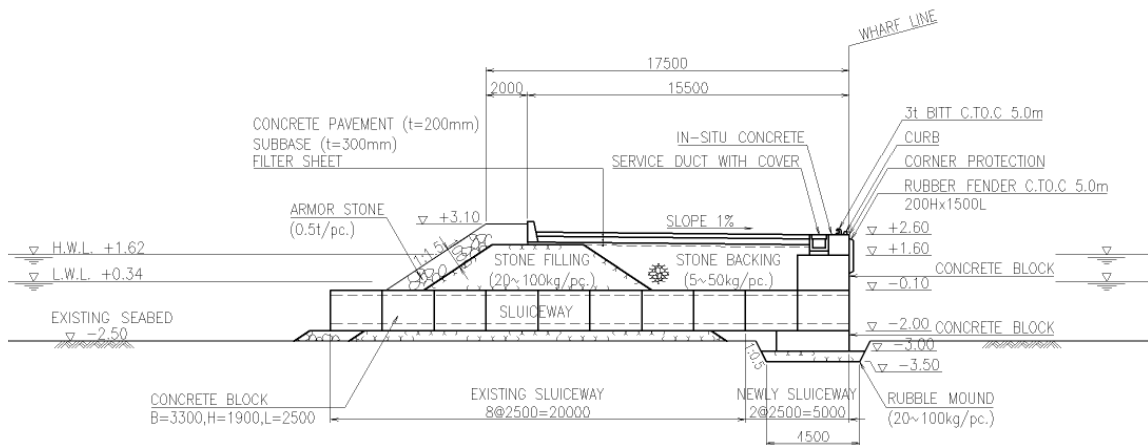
(3) Typical Cross Section of Breakwater
